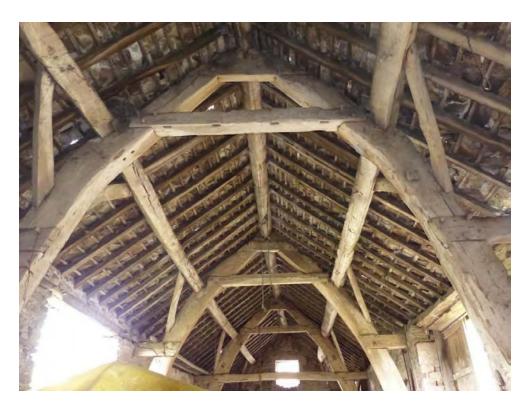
Crucks 3 and 4 looking north with central section of tiebeams removed
